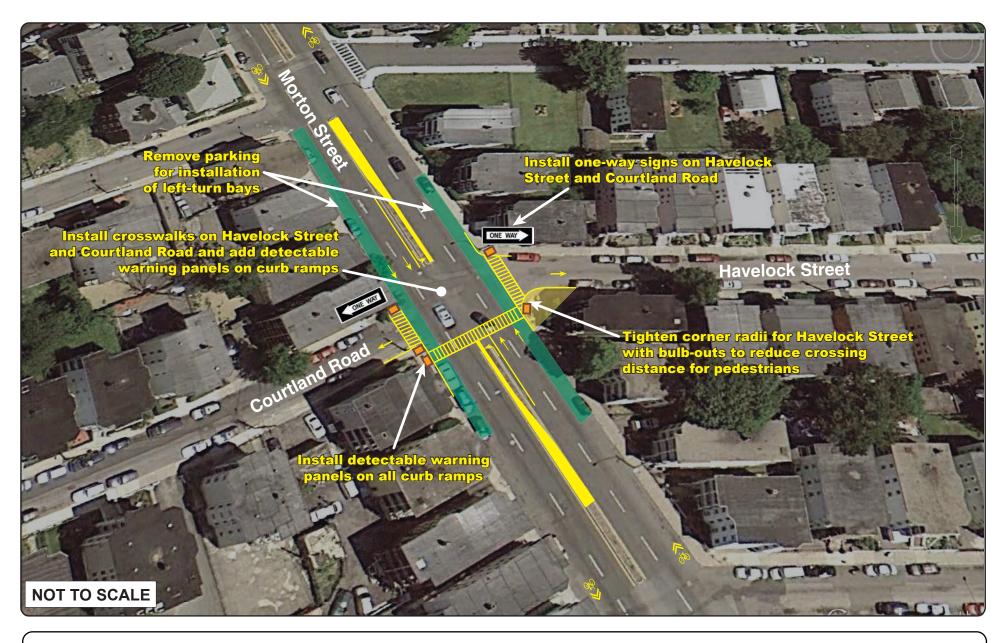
Proposed Improvements at the Intersection of Havelock Street and Courtland Road
